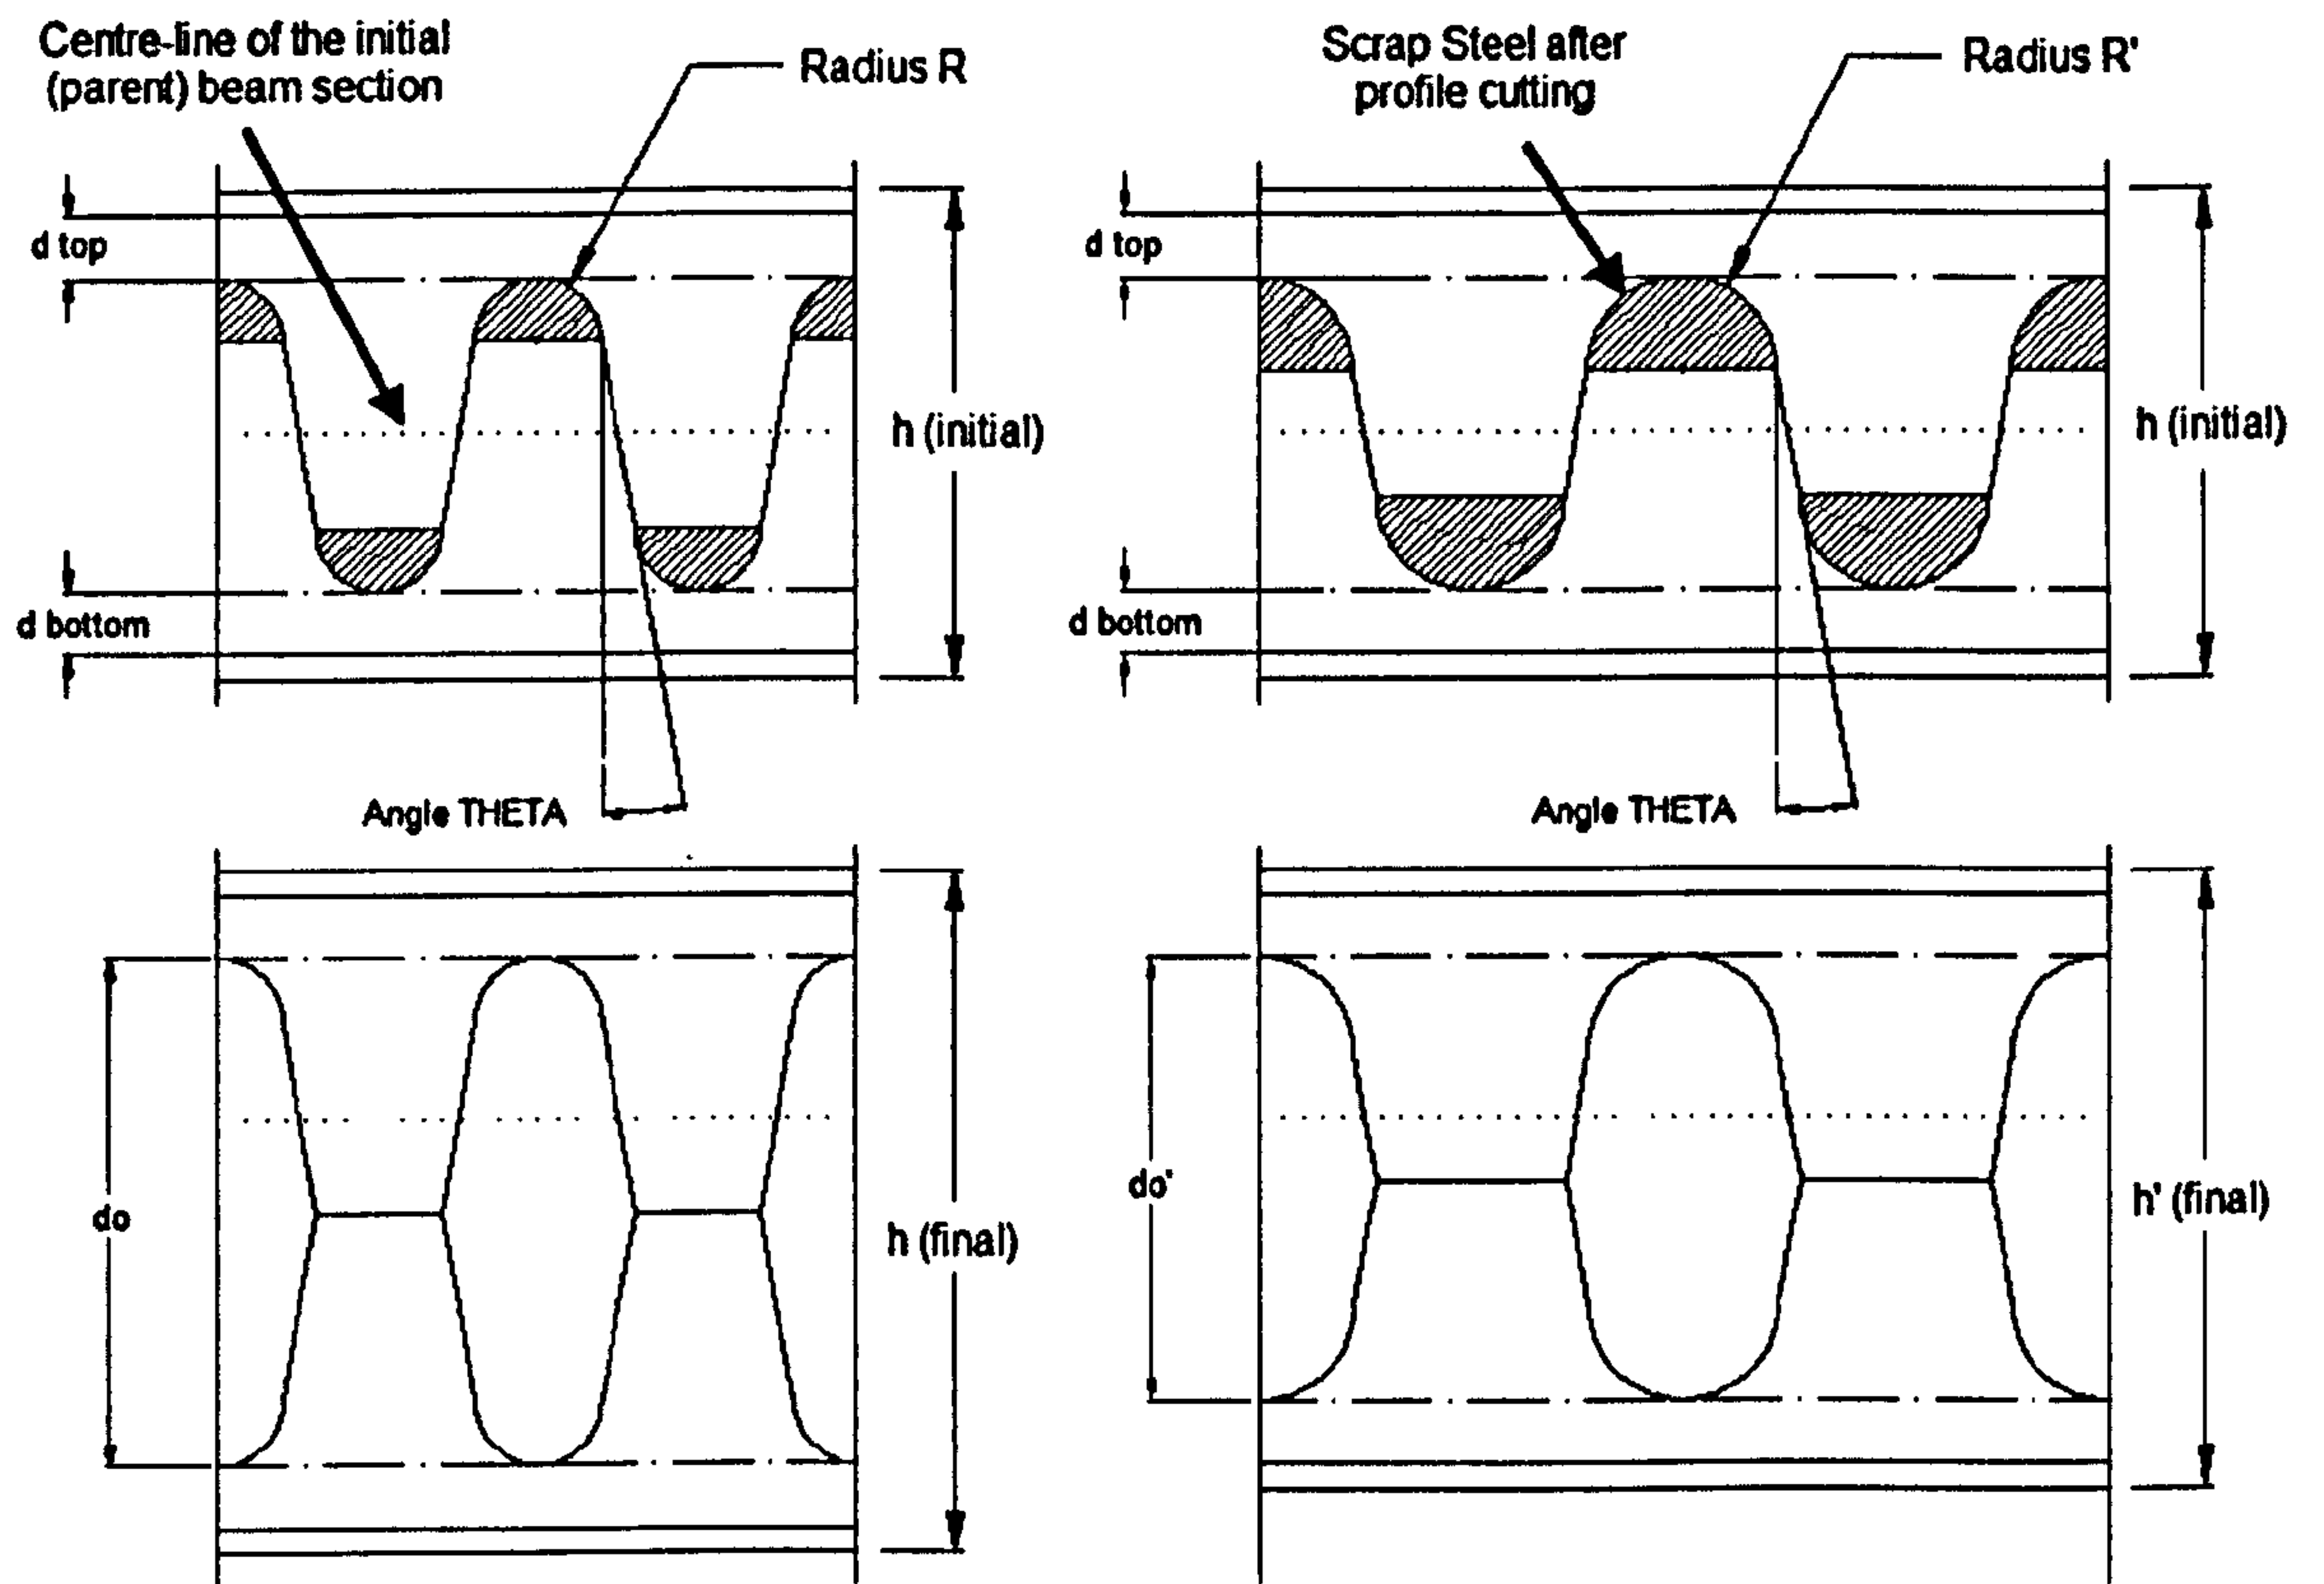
Example 1. Cutting profiles with standard welding length (new profile cut)
